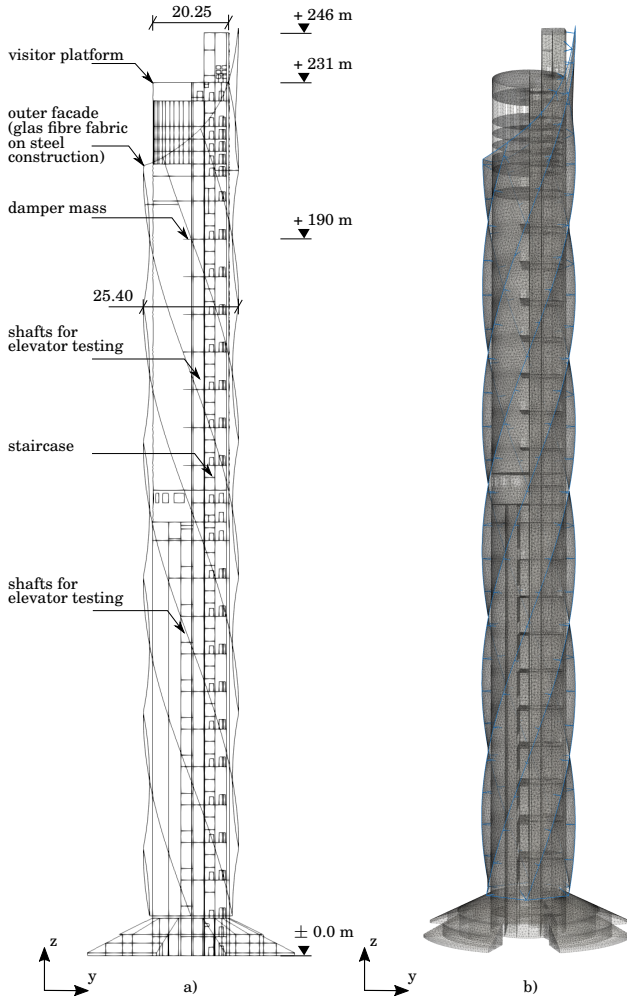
a) Schematic sketch with most important dimensions and parts of the TkT and b) finite element mesh.
